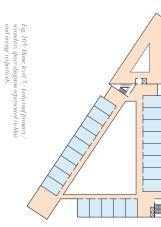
Home level 3/ Ledo Roof floor plan 1:500.
